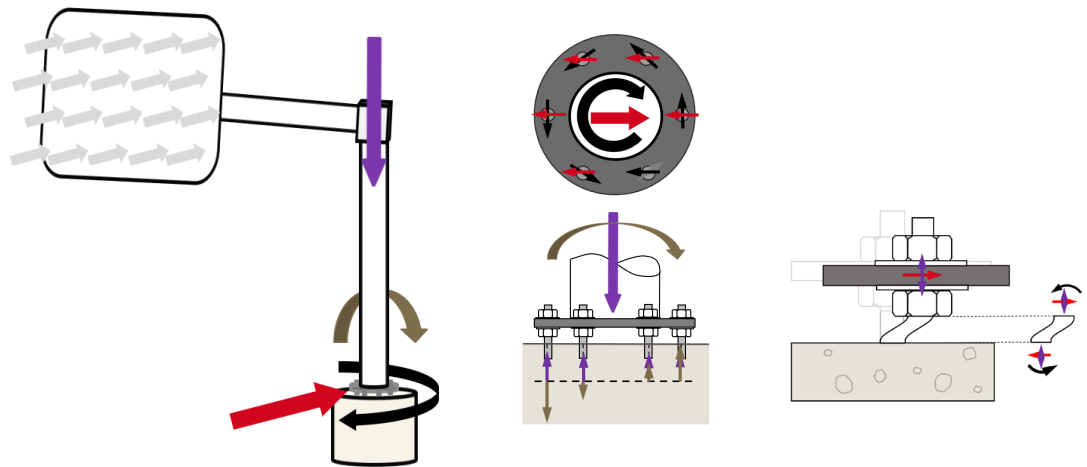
Loads acting on a base connection (left), force transfer to anchors in ungrouted stand-off connections (middle; plan and profile views shown), and forces acting on exposed portion of anchor (right; double curvature shown)
